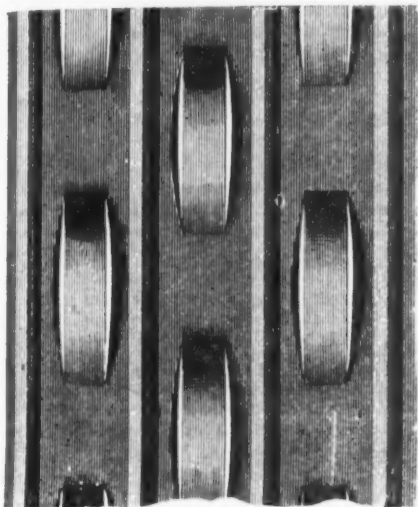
General View of the Bostwick Metal Lath, with the Loop Projecting to the Front.
